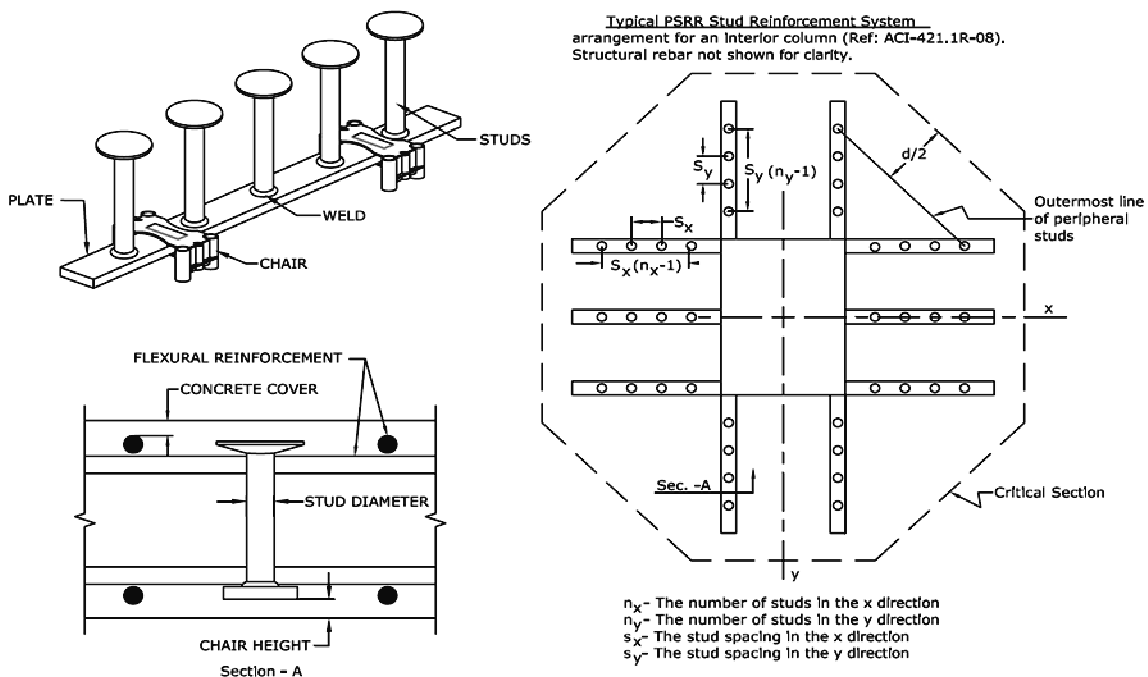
TYPICAL PSRR STUD REINFORCEMENT SYSTEM DETAILS
